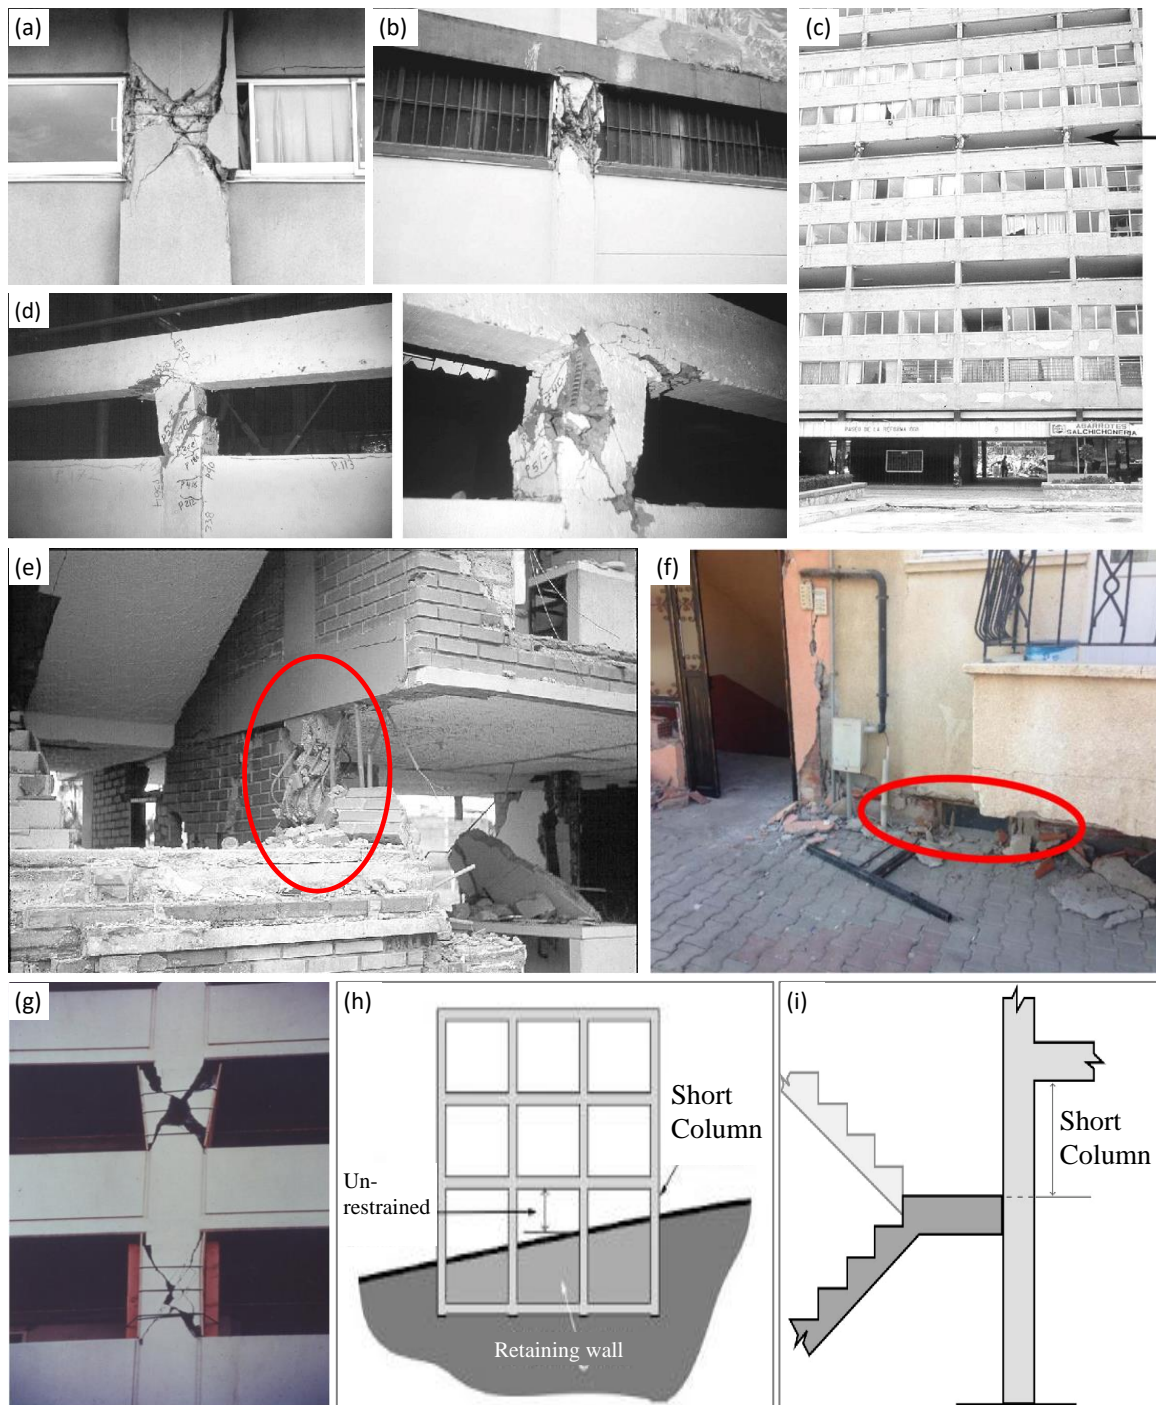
(a,b,c,g) Short column failure (crushing, and X-type cracking) during earthquakes caused by partial infill (EERI, 1996; Guevara & García, 2005); (d) Experimental test on concrete frame with partial infill under lateral load (Pineda, 1994); (e, i) Short column caused by stair connection; (f,h) Short column caused by partially buried basements (Duran et al., 2020)
